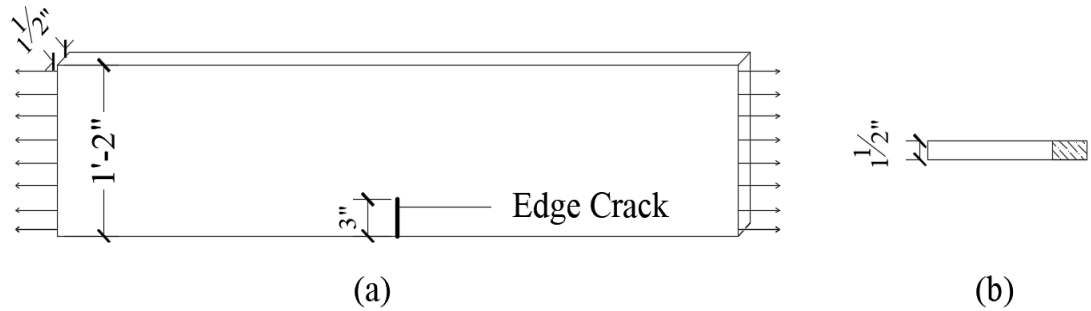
(a) Elevation and (b) Cross-sectional View of an Edge Crack Configuration in an Axially Loaded Plate
